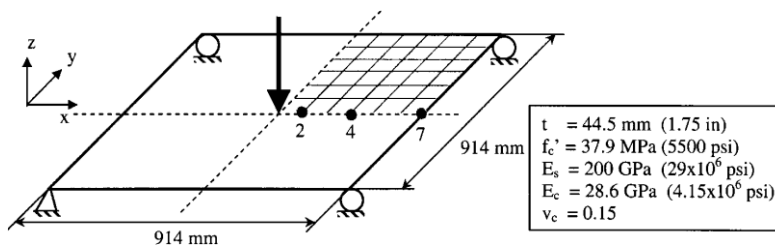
Schematic of corner-supported reinforced concrete slab tested by Jofriet and McNeice [24]
